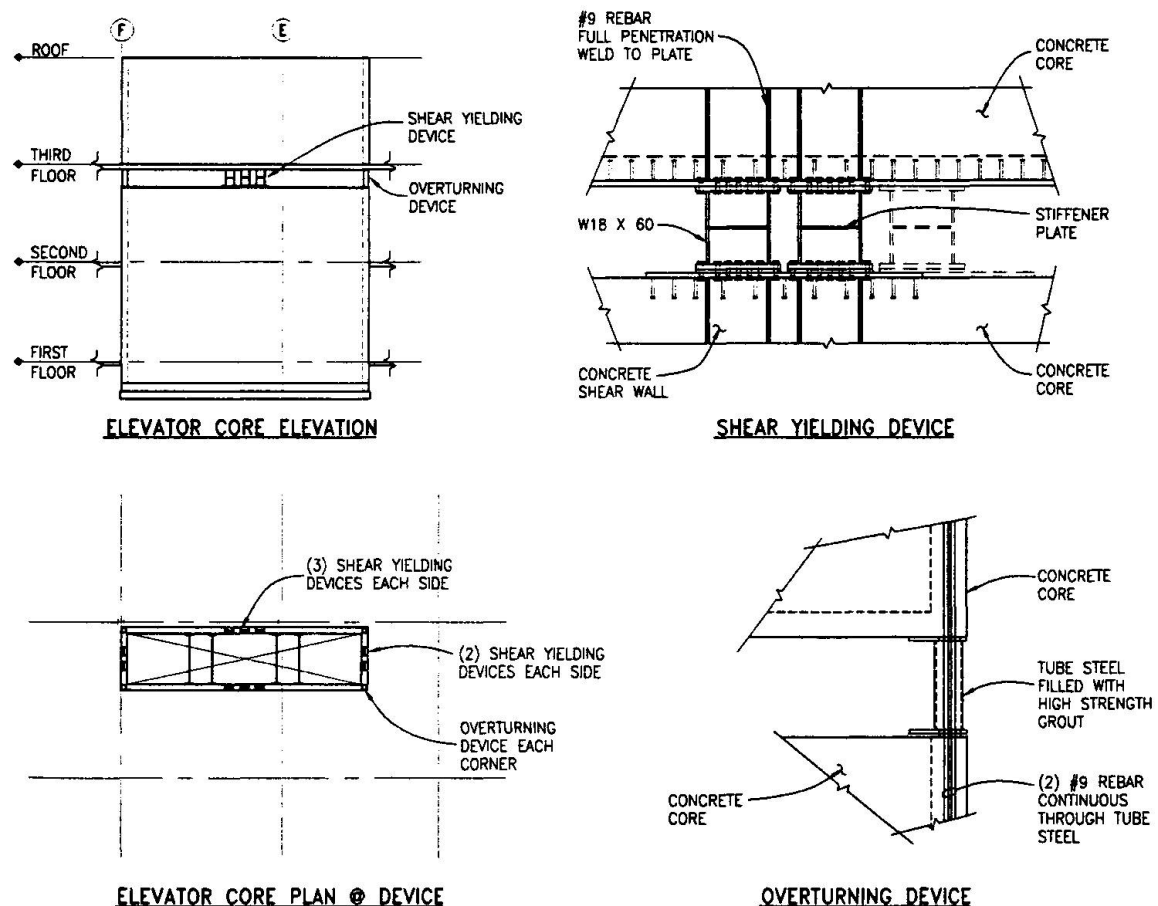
Elevator core as part of the primary horizontal system (PH-system) with seismic link below the 2nd floor ceiling. Shear panel dampers as hysteretic devices and grouted steel tubes in corners as overturning devices.
